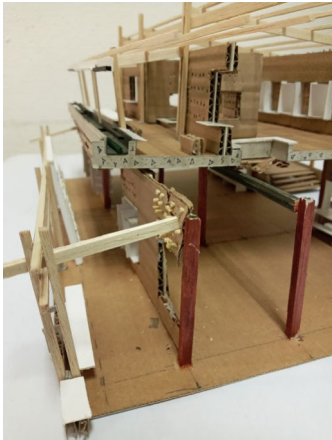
Collage exploring the parts of the model: detached façade, outdoor rooms, shelf-windows, light-wells, bottle in walls, hammocks, boardwalks as architecture(Author 2021)
